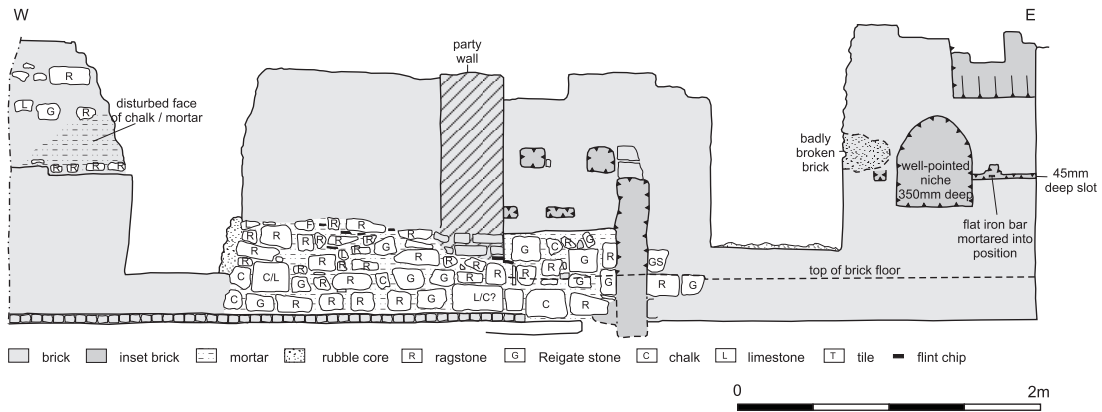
South-facing internal elevation of the northern wall of the cellars of Buildings 12 and 13 at SNQ99 (Scale 1:50)
